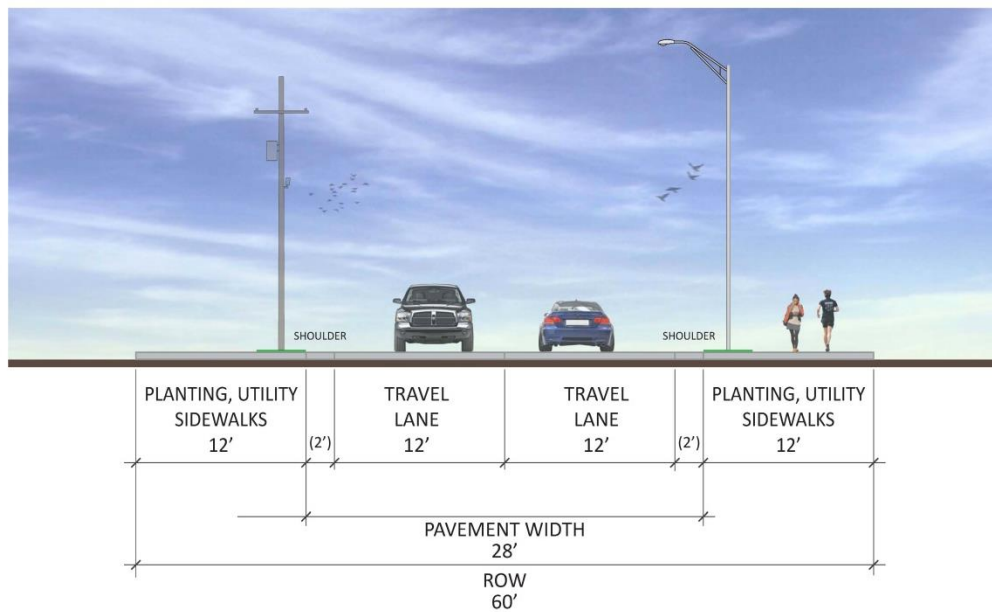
Urban Major and Minor Collector Street Cross-Section
